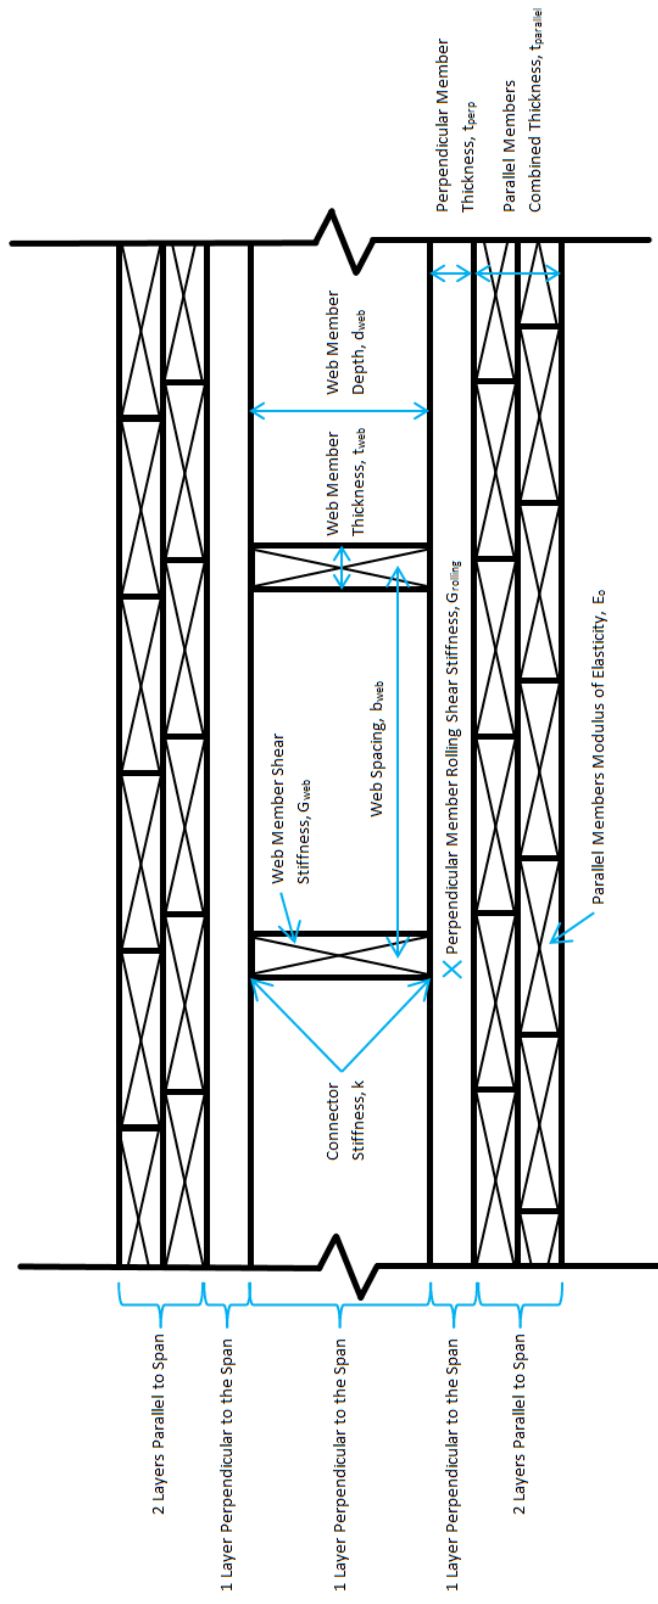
Cross Section and Variables Used In SAP2000 Parametric Study
